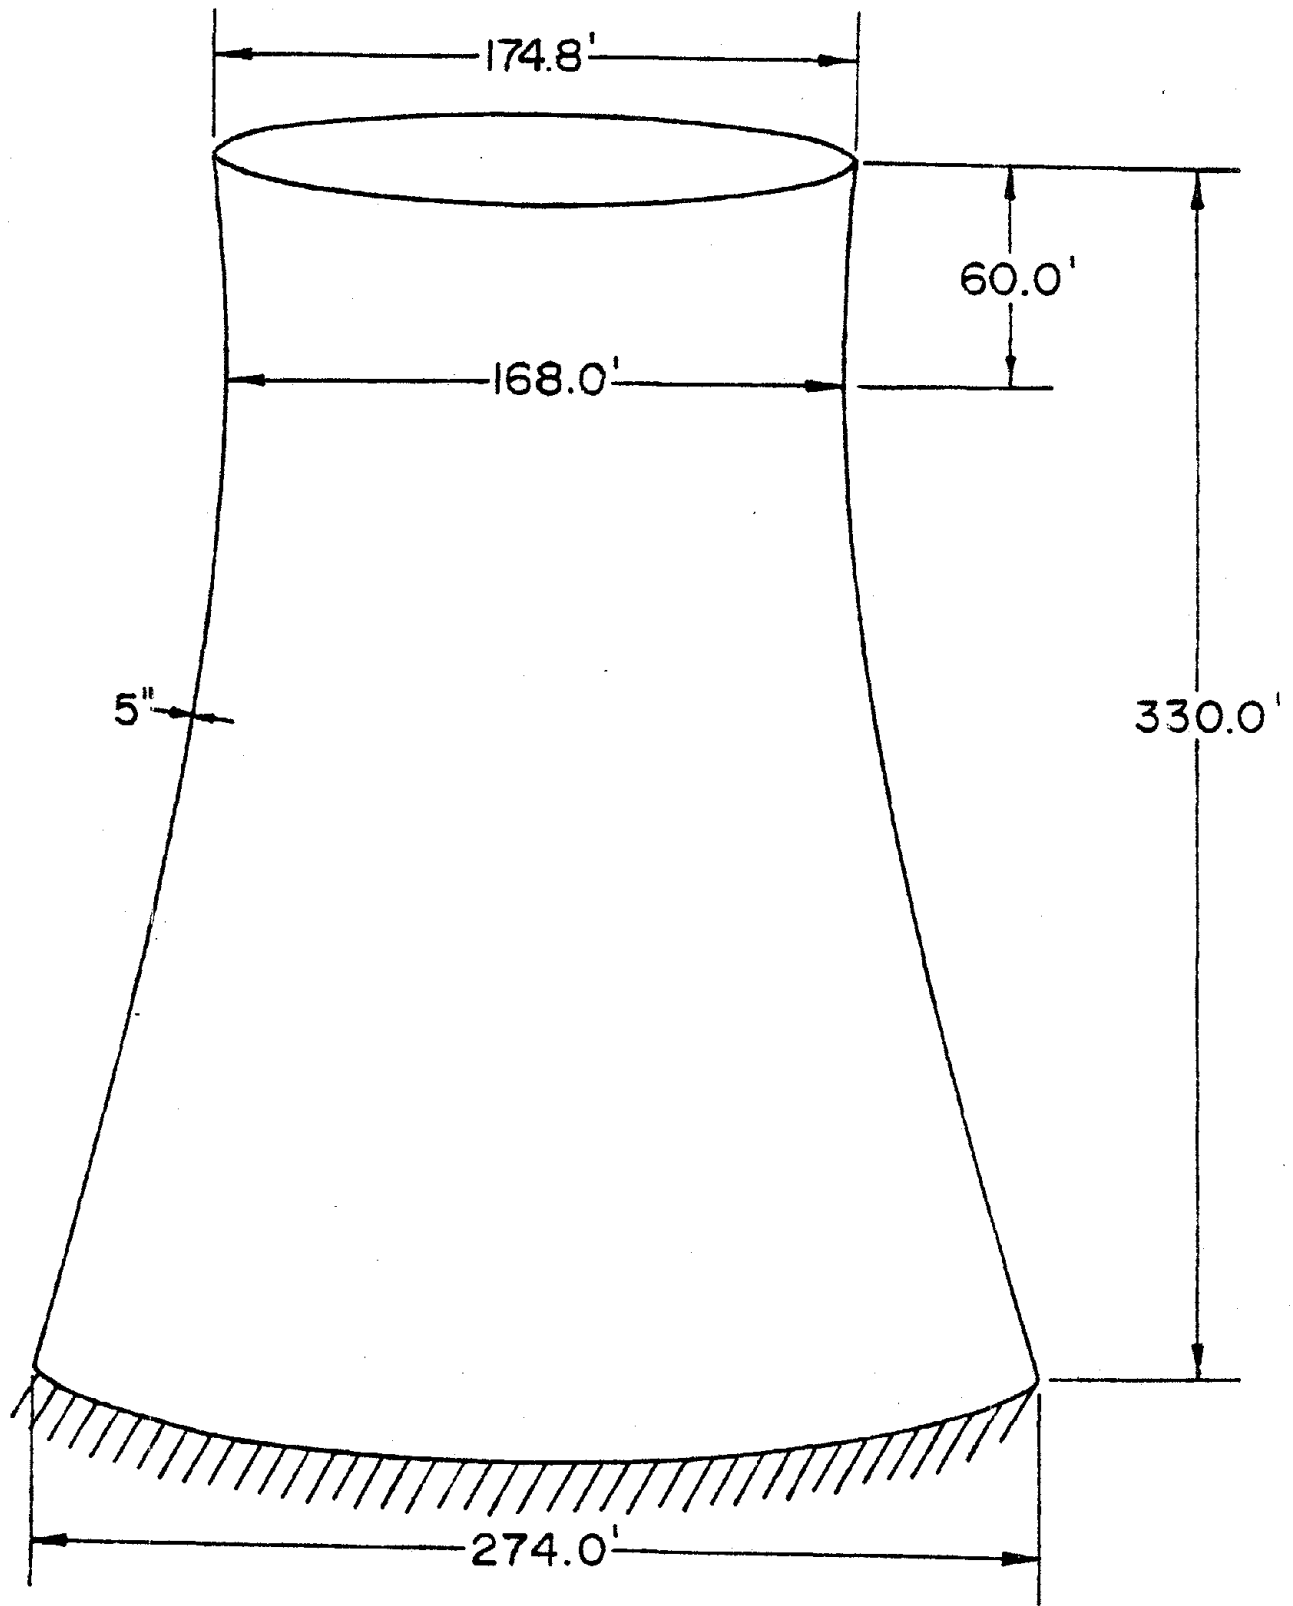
An Example of a Reinforced Concrete Cooling Tower with Base Fixed.
